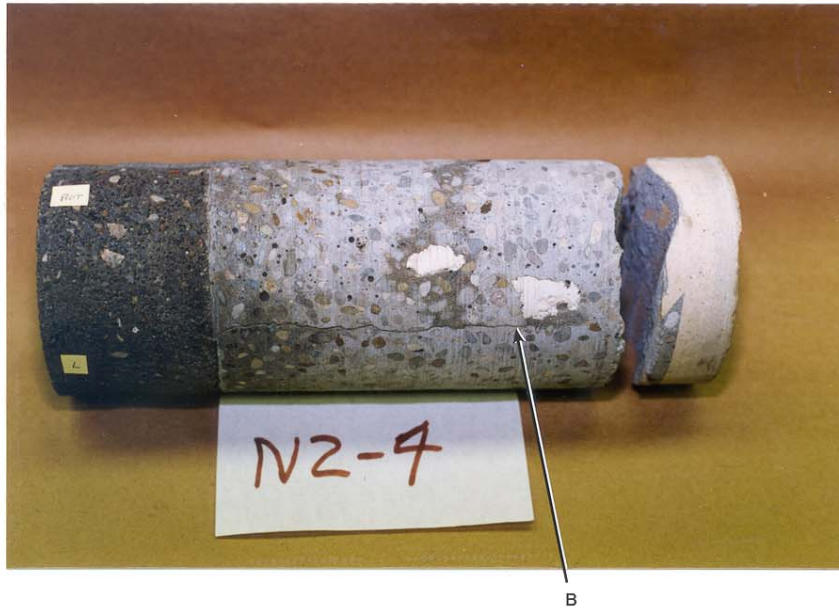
Crack "B" appears to be a parting line between concrete pours. (see photo 2.1).
